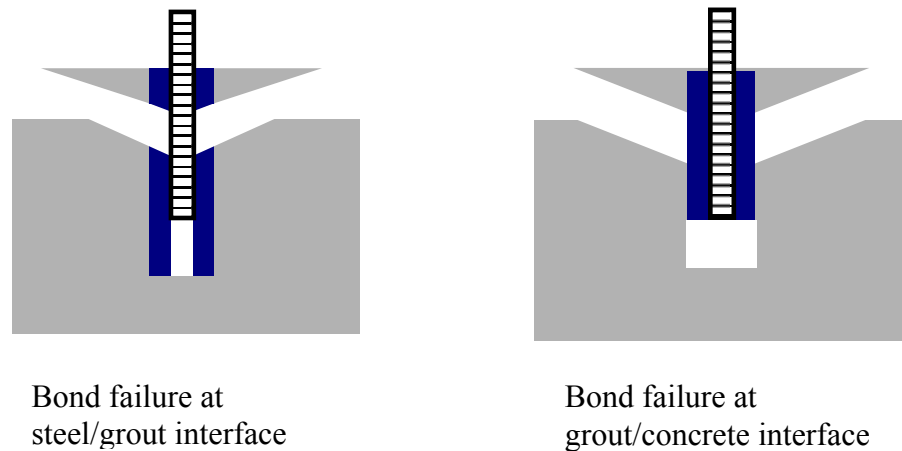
Typical bond failures at the steel/grout and grout/concrete interfaces for unheaded grouted anchors
